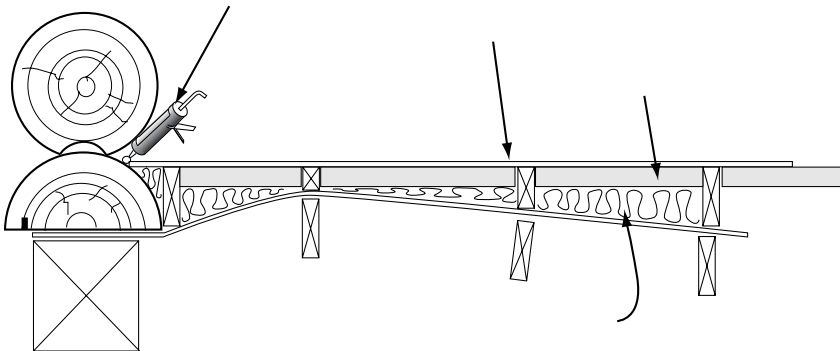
If the existing floor is not level, compensate for it when adding insulation on top to create a level floor
